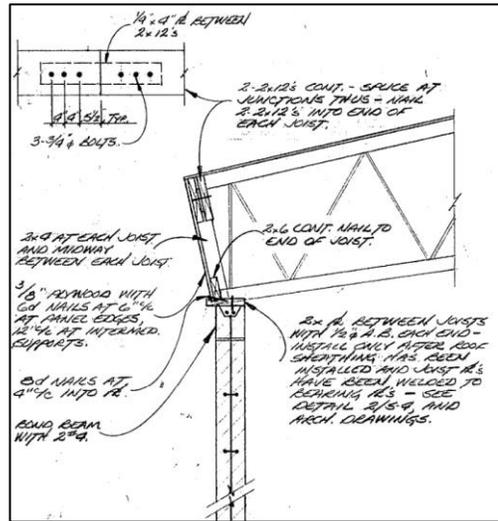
Natatorium roof framing connection to bearing walls per the 1974 Construction Documents
